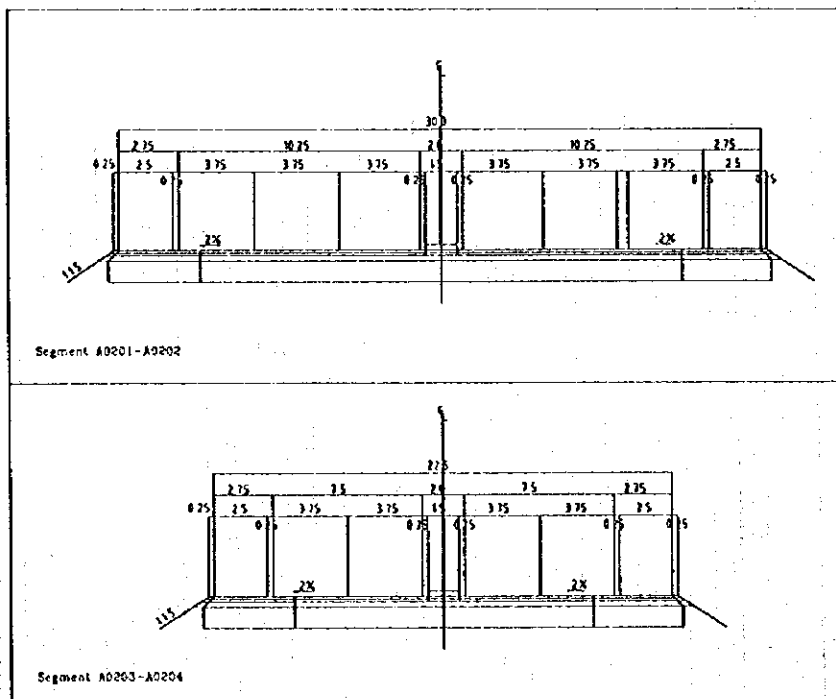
Typical Cross Section of NH-3 Widening Scheme
